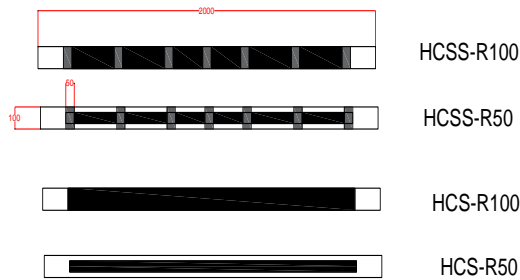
Bottom View of Rib for Each Strengthened Specimen (All Dimensions in mm).
